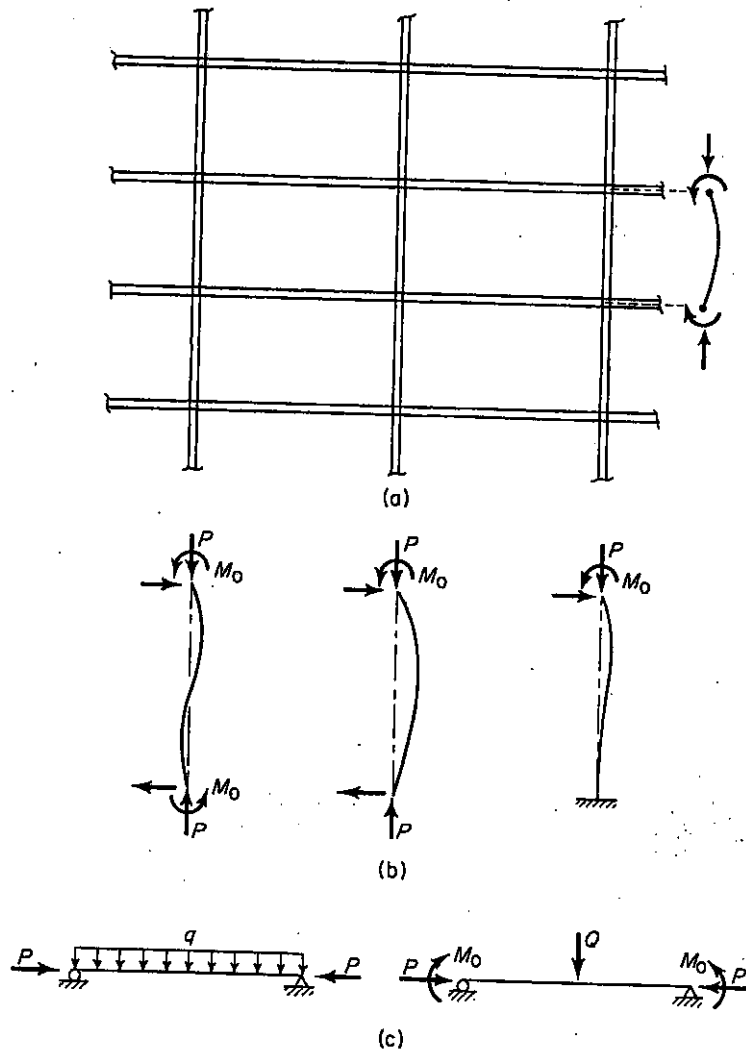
Beam-columns and beam-column loadings. (a) Beam-columns in a frame, (b) typical beam-columns in frames, (c) typical beam-columns with transverse loads.
